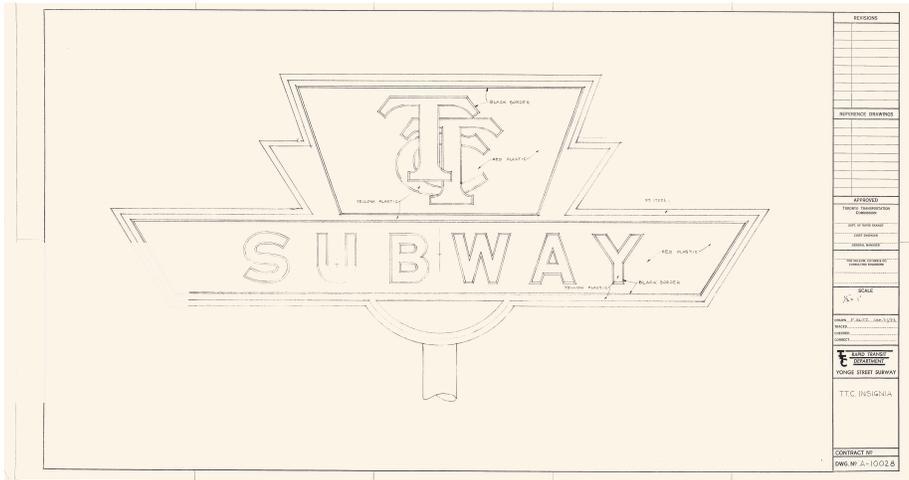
Detail of the TTC Insignia Pylon design circa 1953 - TTC Engineering, Construction & Expansion
